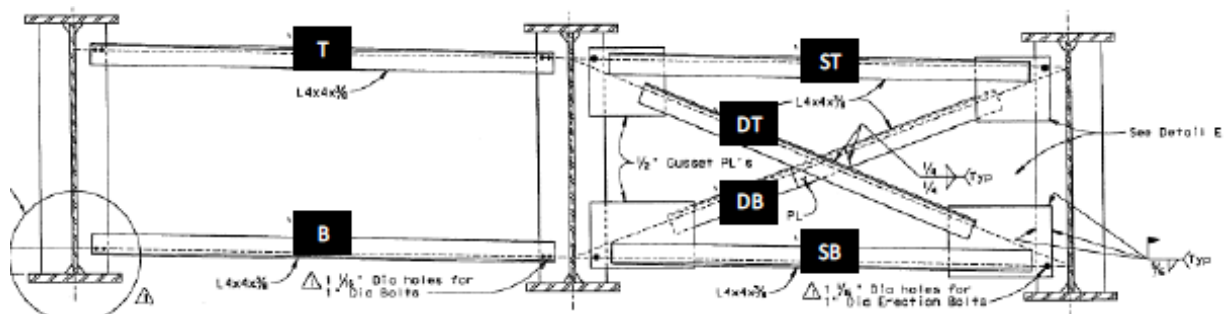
Strut and Cross Frame Strain Gage Locations for 19th Street Westbound Bridge
